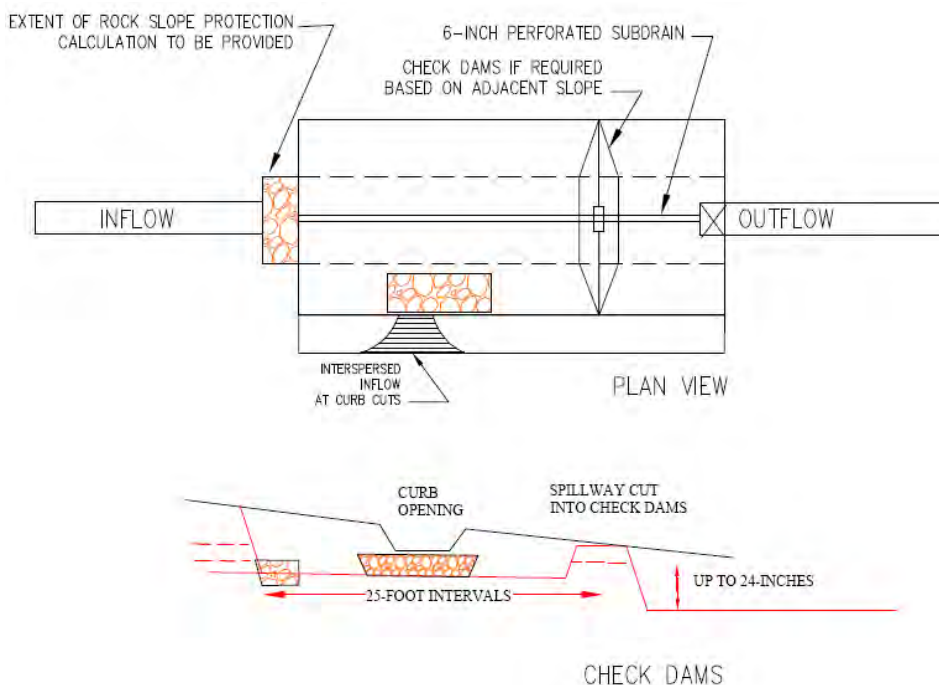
Check dam (plan view and profile) for installing a series of linear bioretention cells in sloped area
